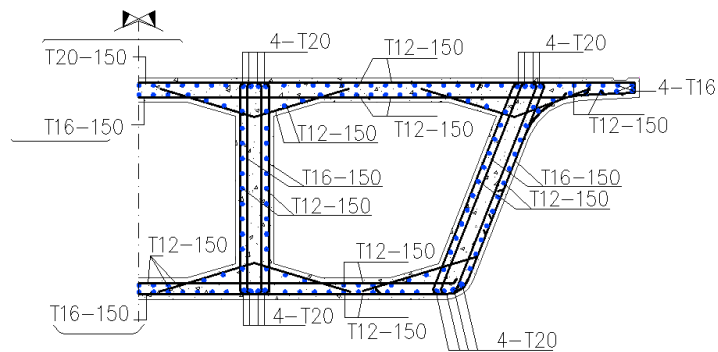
RC Bridge. Reinforcement details of a typical deck section.
